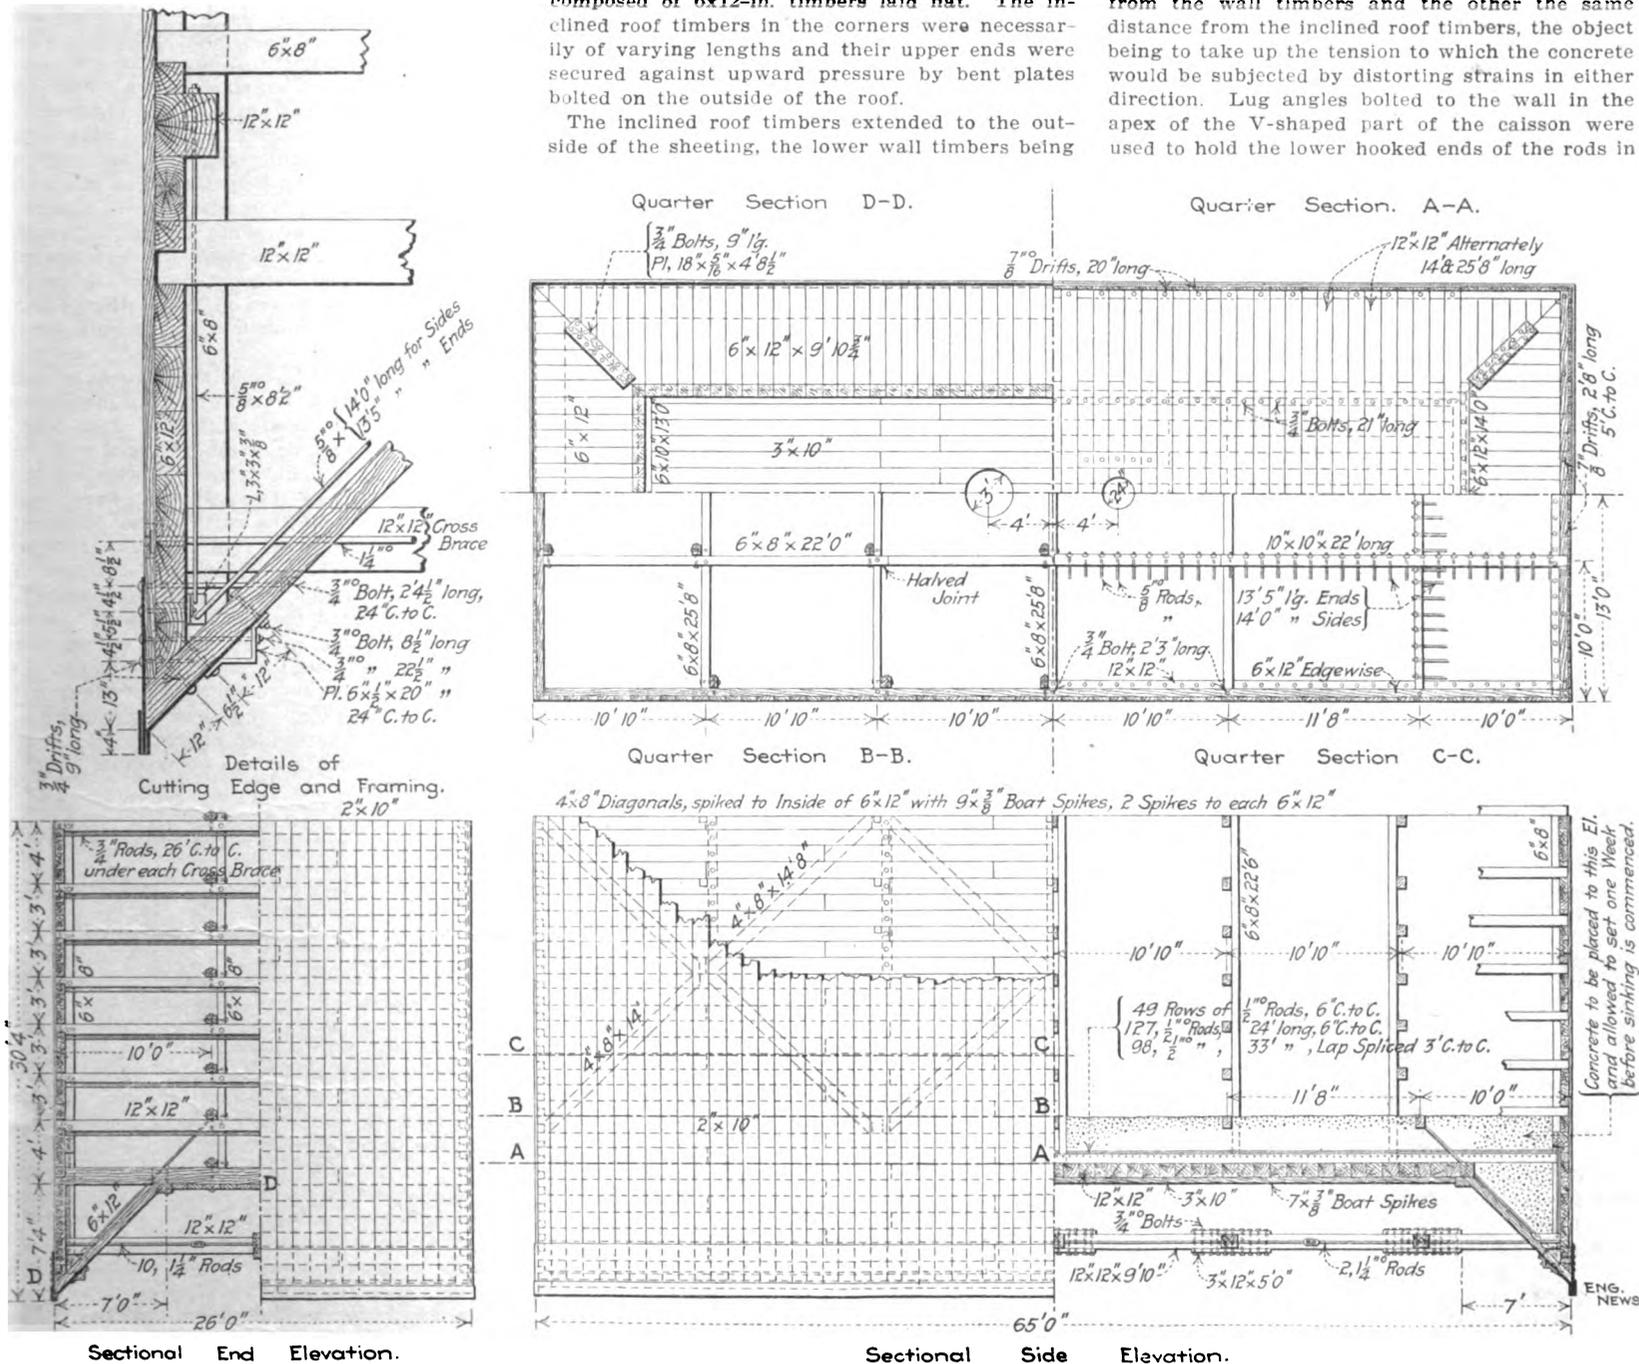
TIMBER AND CONCRETE CAISSON FOR PIER NO. 4.
